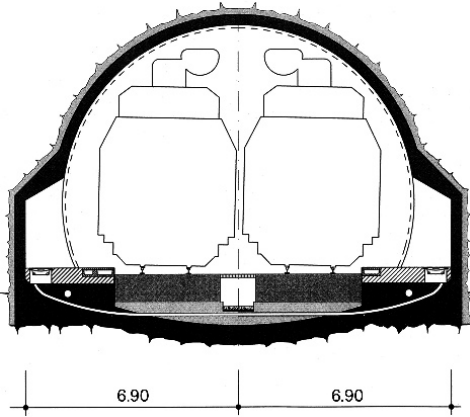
Cross-section with safety niches – conventional tunnelling.
